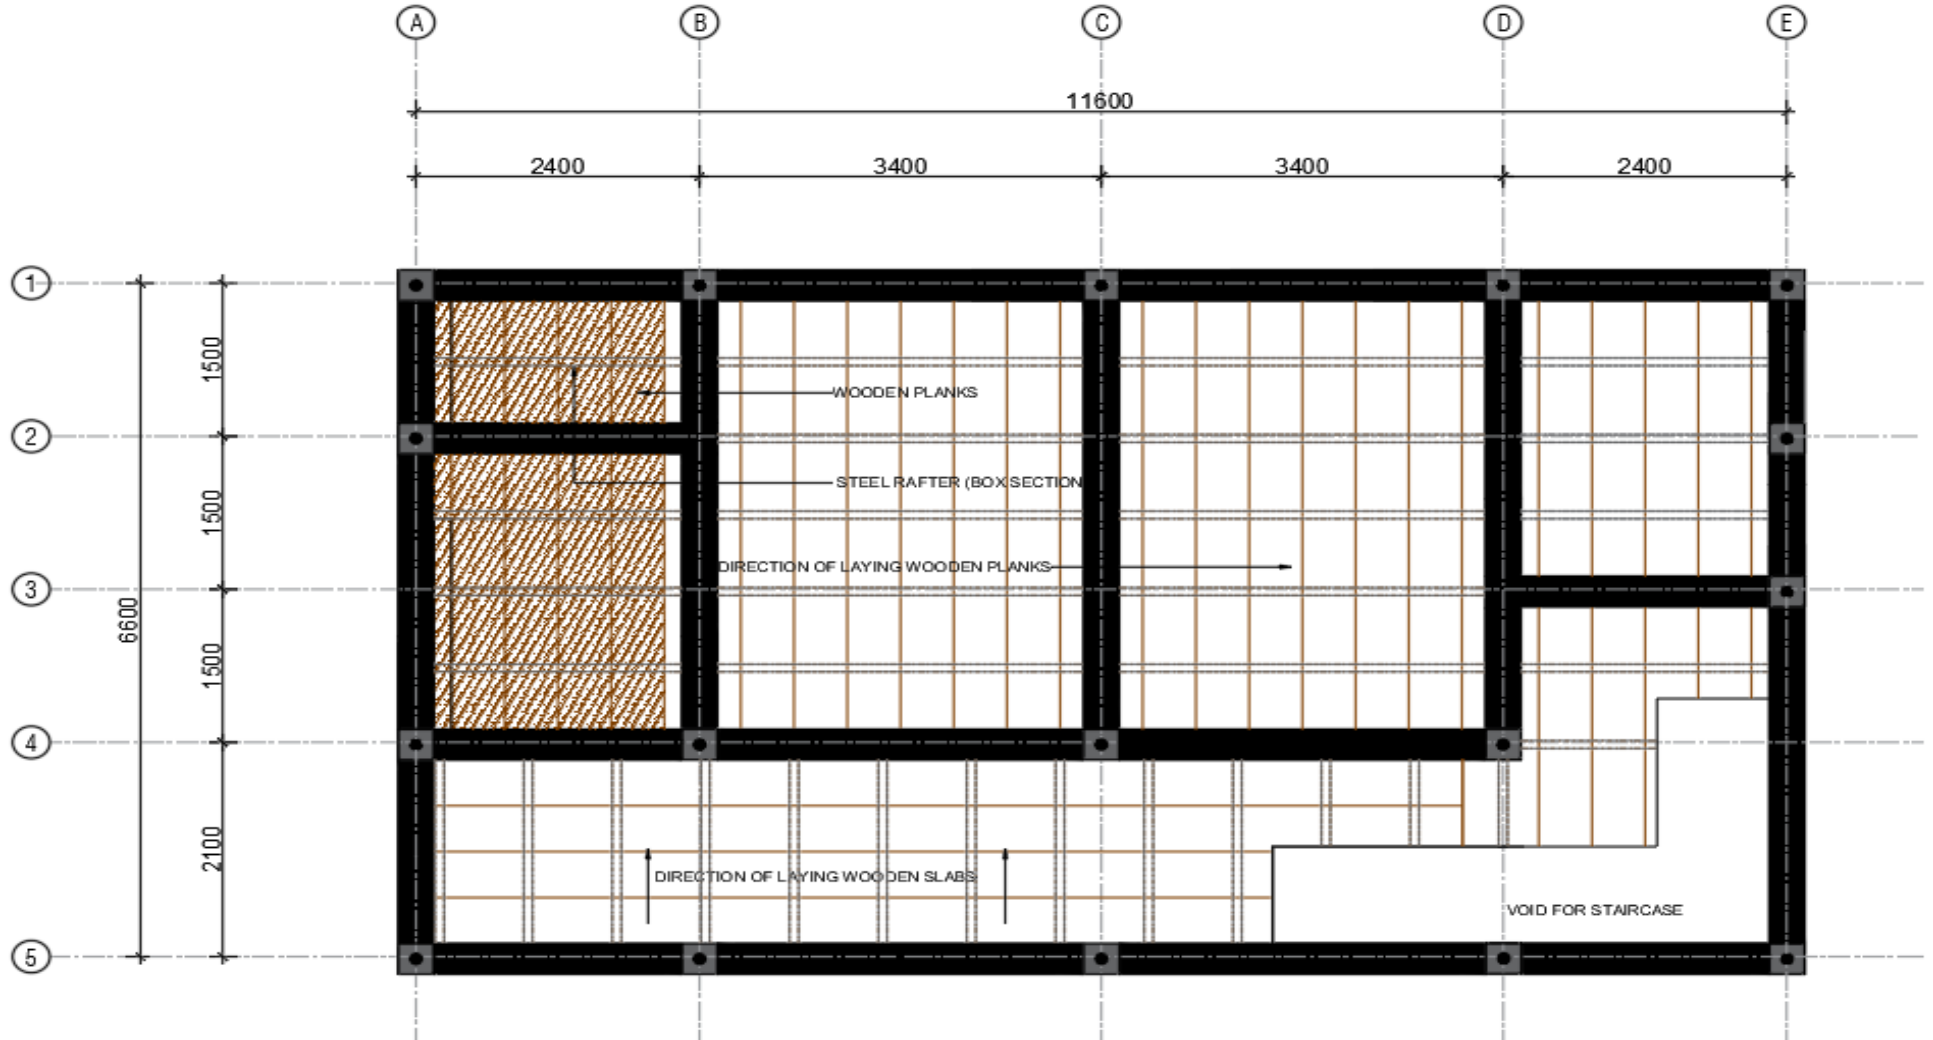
24. Roof slab detail (Refer text on previous page)
